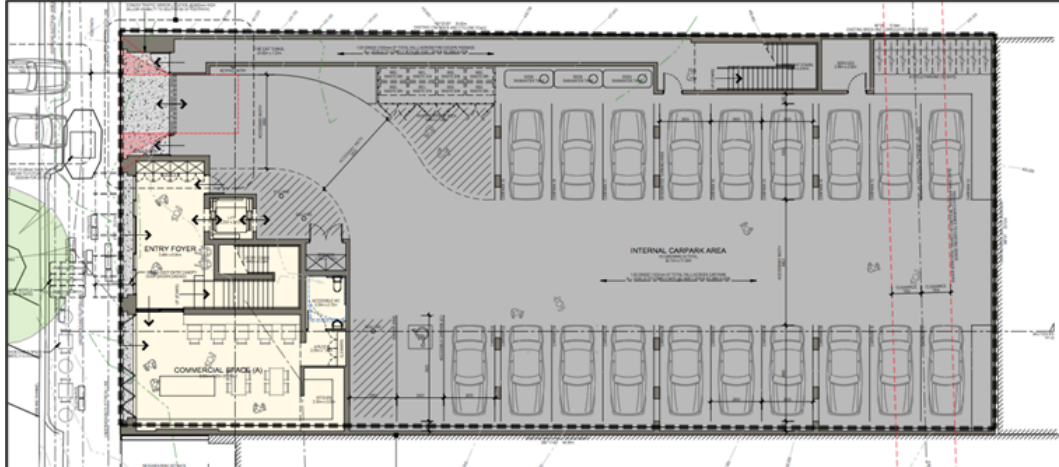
Ground floor plan. Source Application plans Project Now Architects
